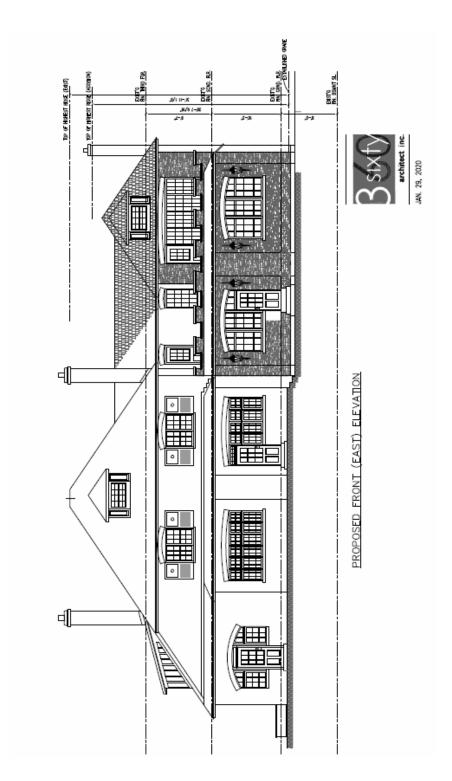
The front or east elevation of 1341 Stavebank Road with proposed addition. (Image from owners.)
